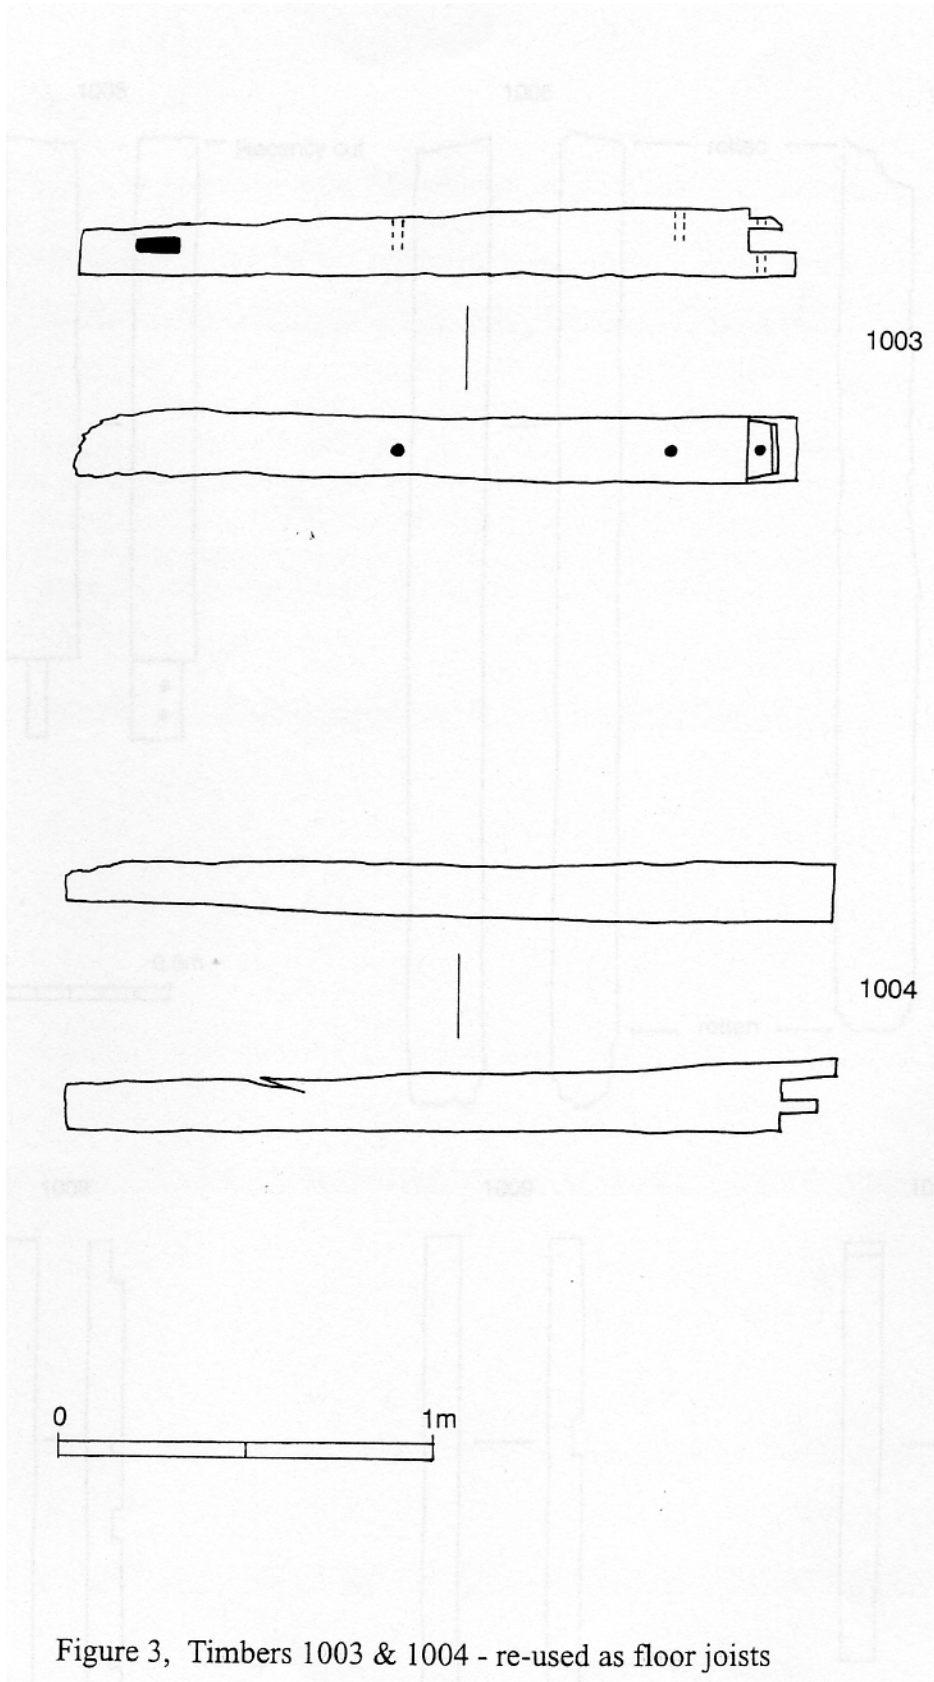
, Timbers 1003 & 1004 - re-used as floor joists
